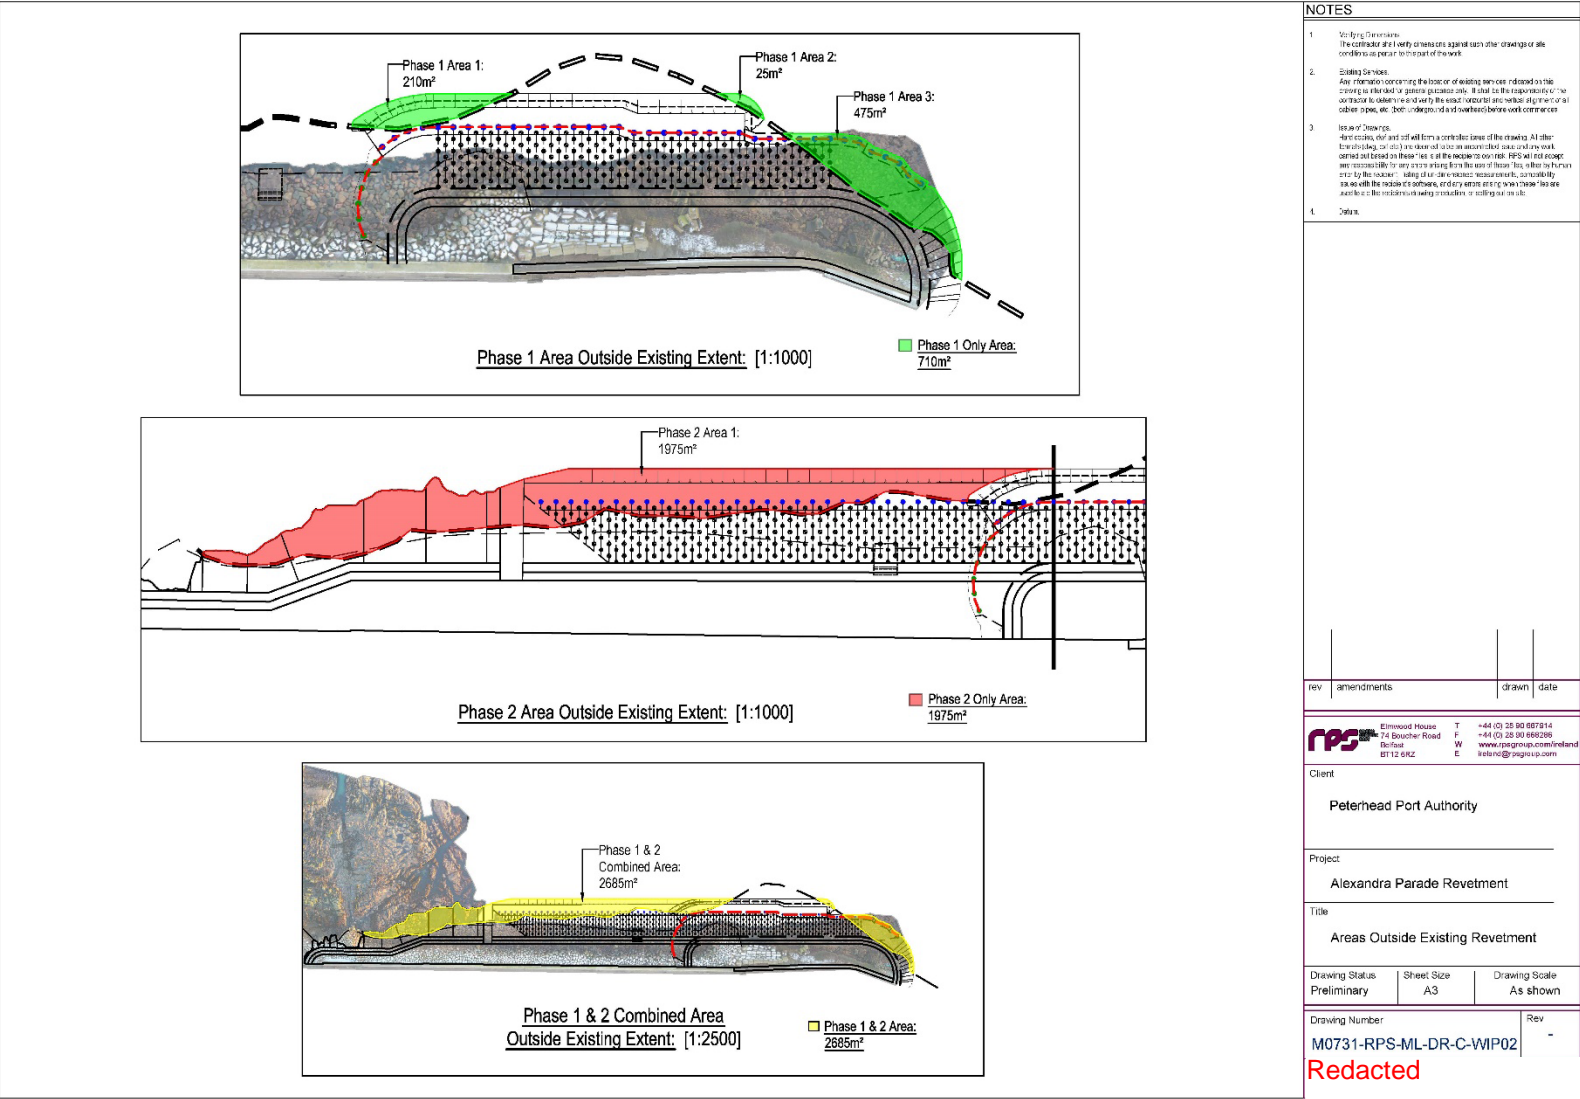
Extent of construction footprint outside the existing revetment boundary.
